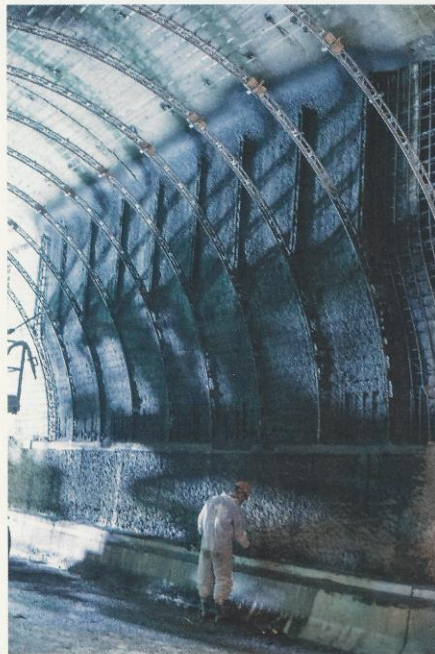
Construction sequence Step 4—curved and vertical sidewall sections are shotcreted
